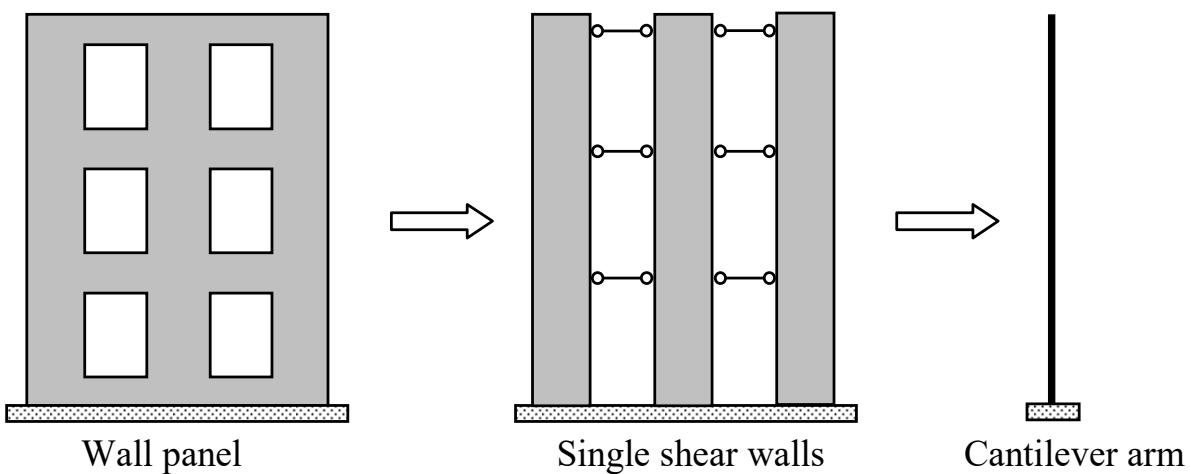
Wall panel, single shear walls and cantilever arm as equivalent static system
